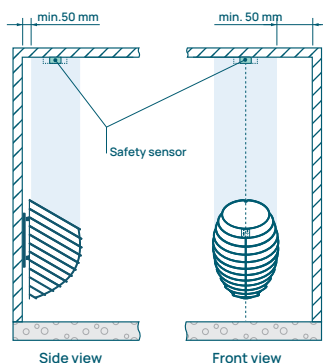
Installing the safety sensor on the ceiling: wall-mounted heater
